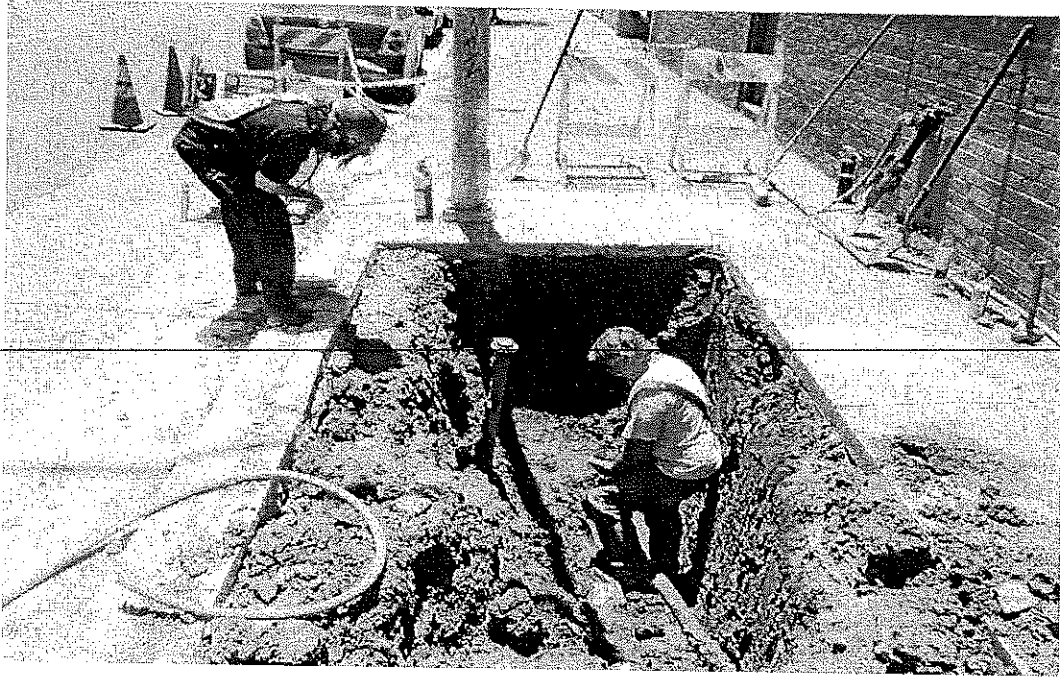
Checking LEL under the supervision of Oakland Fire Department Inspector. Fill pipe is located approximately one foot from the UST north end. UST extends about 3 feet beyond the light post. The sidewalk concrete cuts were made before it became known that the UST extended beneath the light post.
